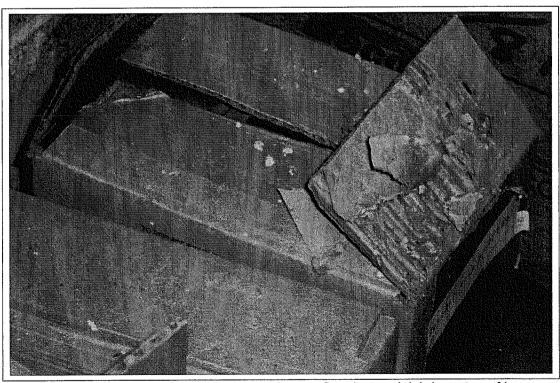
parts/stockroom - delaminated fireproofing dust and debris on top of boxes
